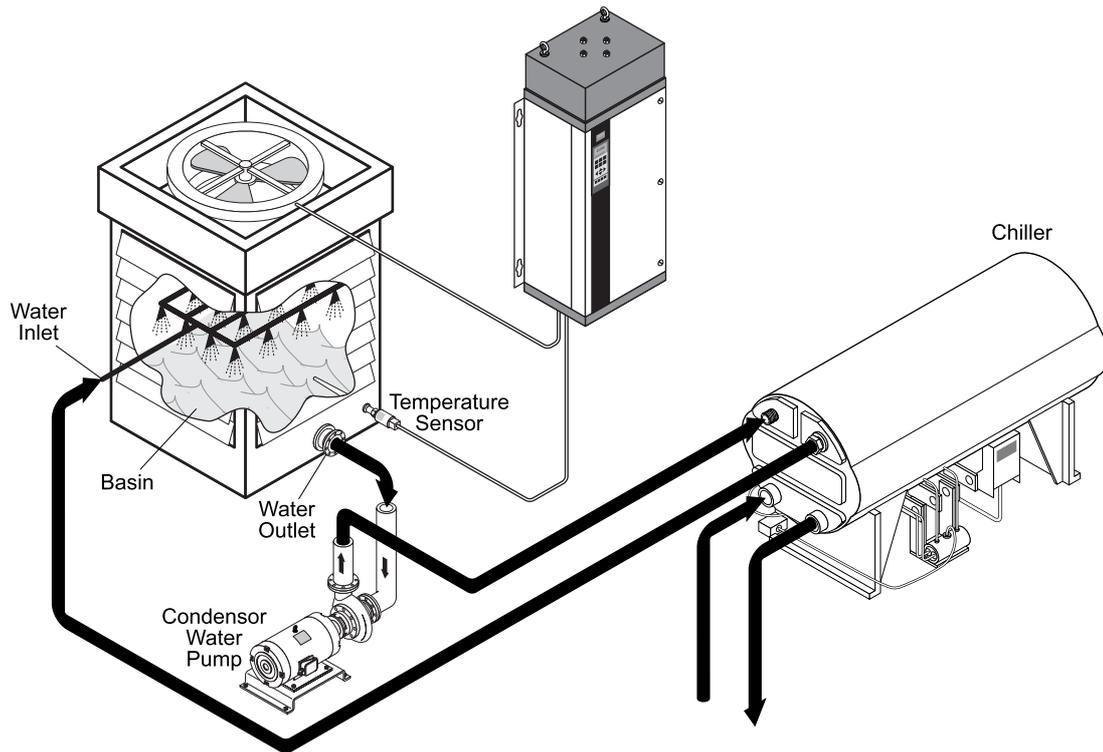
Cooling Tower Chiller Condenser System with Adjustable Frequency Drive
